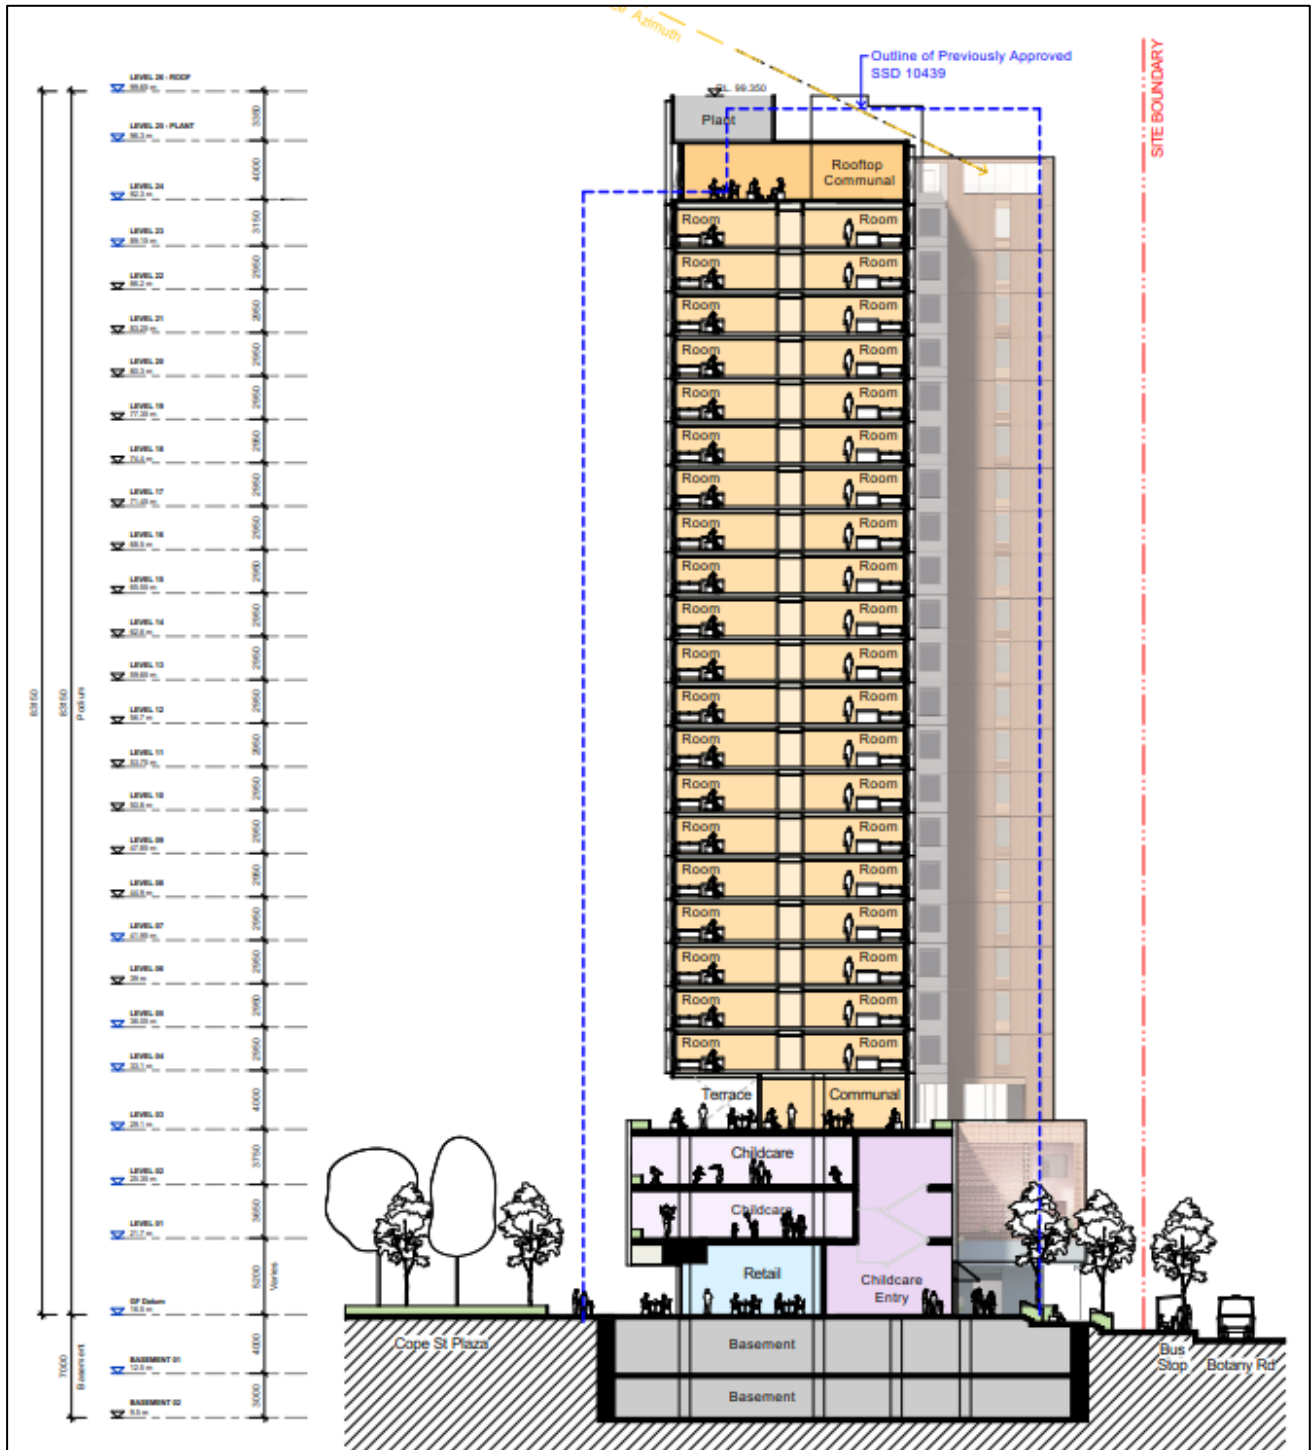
Central Precinct design development: longitudinal section from Raglan Street view
